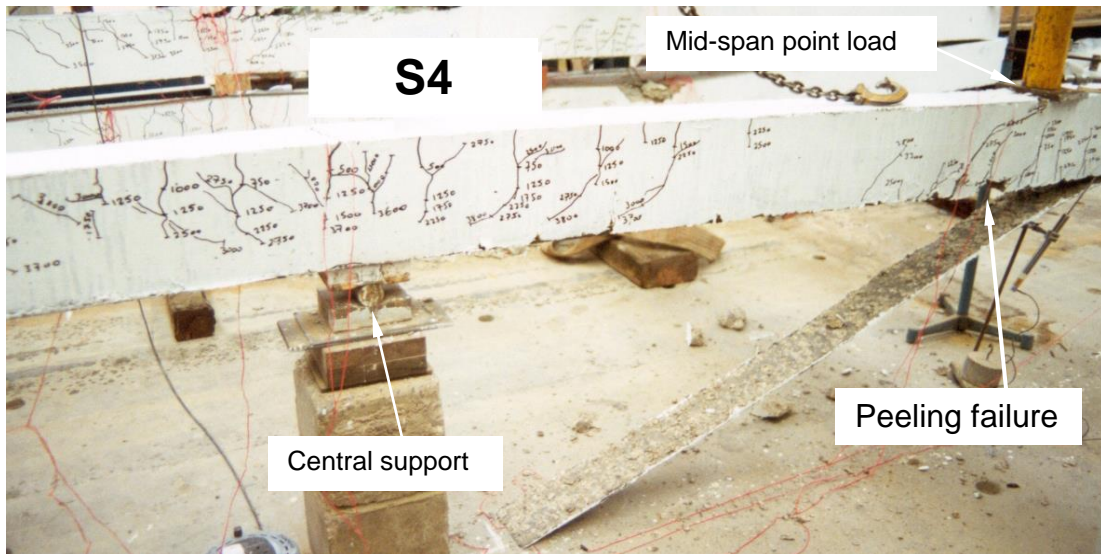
Peeling failure of the concrete cover under the point load away from CFRP sheet end (beam S4)
